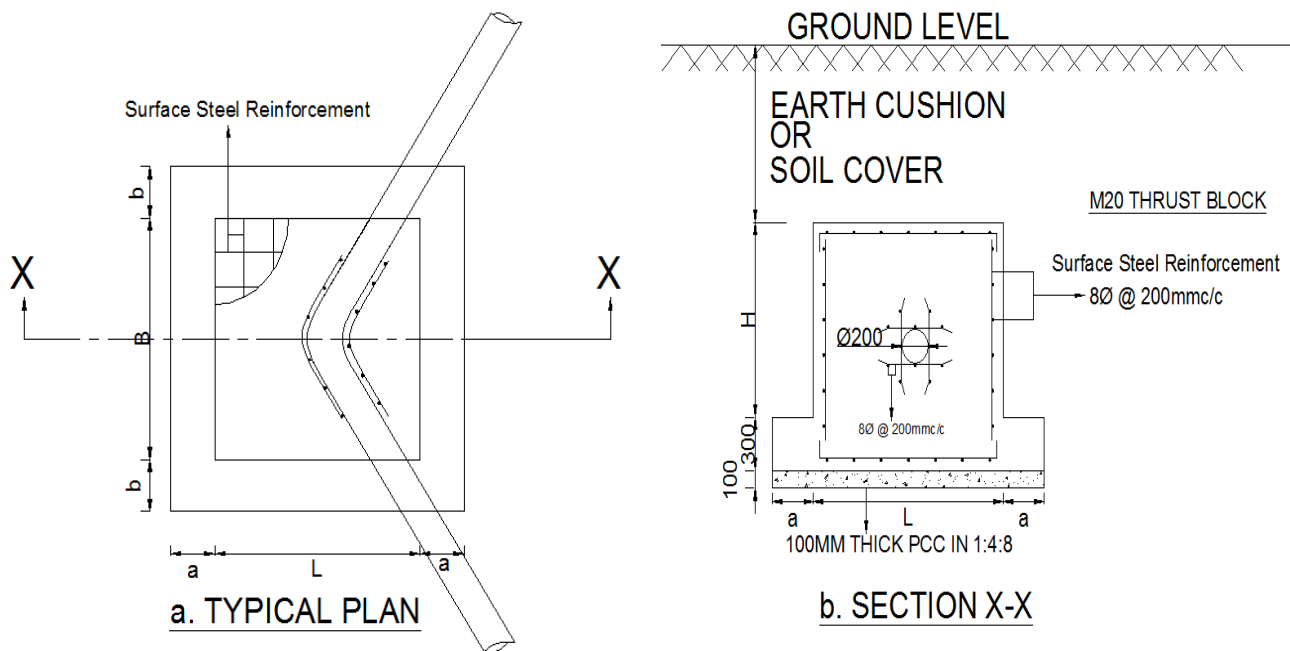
Showing Typical Plan And Sectional Elevation Of Thrust Block [16]
